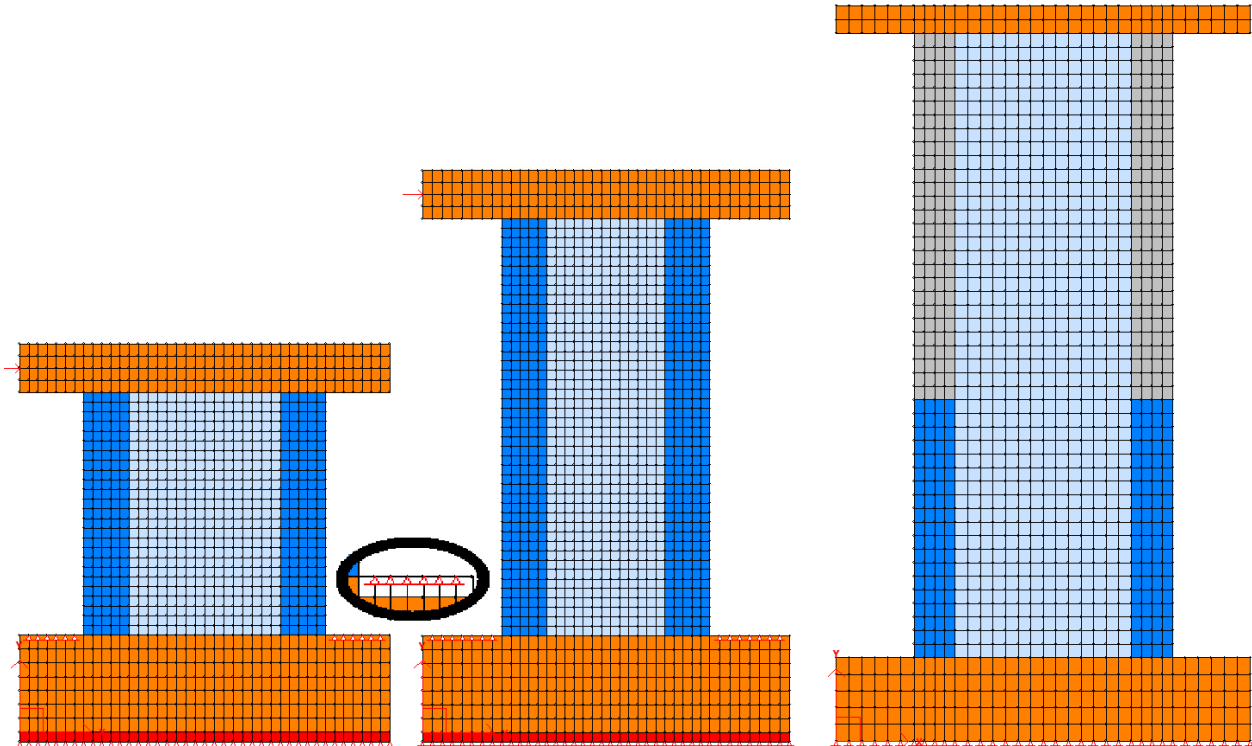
Typical finite element meshes for shear wall specimen series SW1 (Lefas et al., 1990), SW2 (Lefas et al., 1990), and Specimen B4 (Oesterle et al. 1976)
